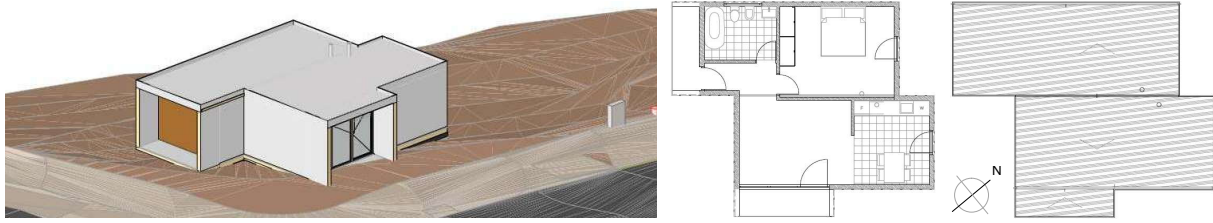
Architecture's external view (left), floor plan (centre) and roof plan (right)
